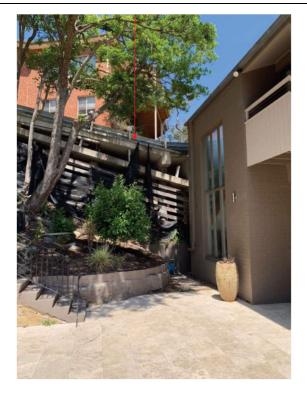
The site's mid level lawn area looking west between the garage and the dwelling
